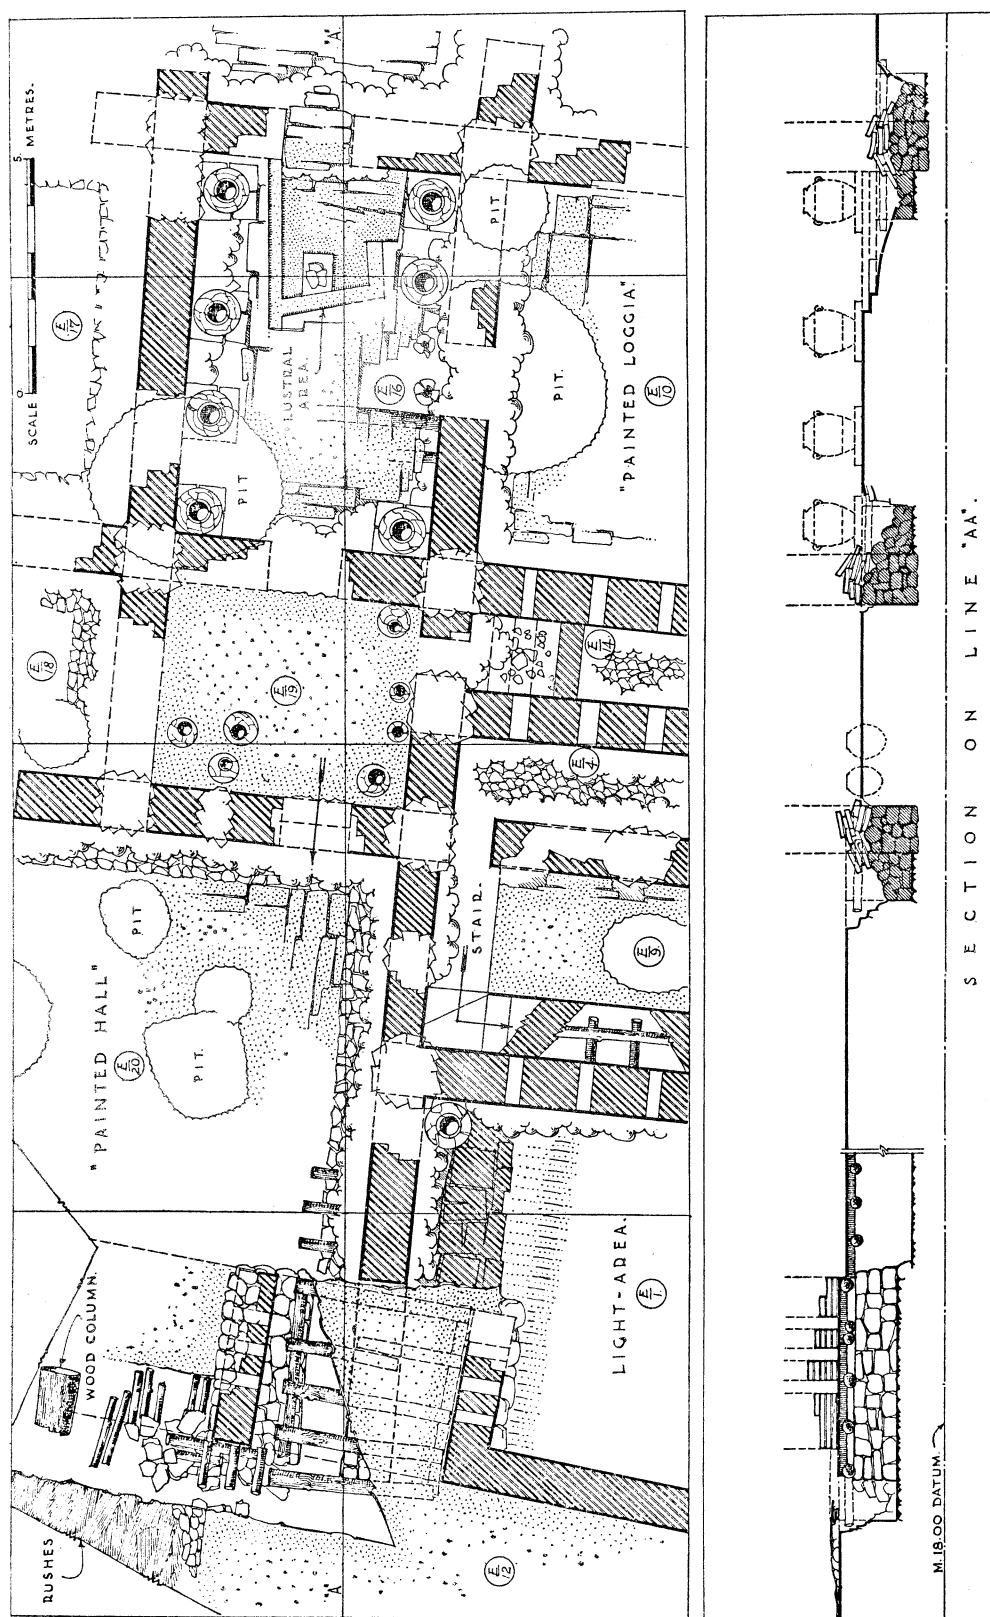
Plan and Section showing Main Extensions to Palace Plan in 1955 Season.
